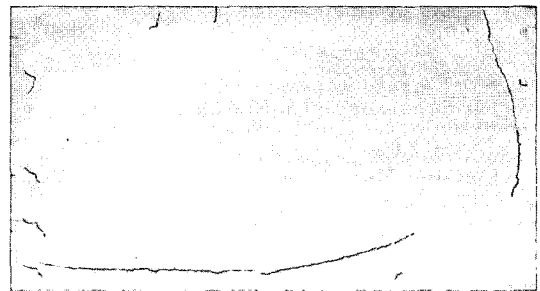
Crack pattern of PVA fiber reinforced mortar after plastic shrinkage test
